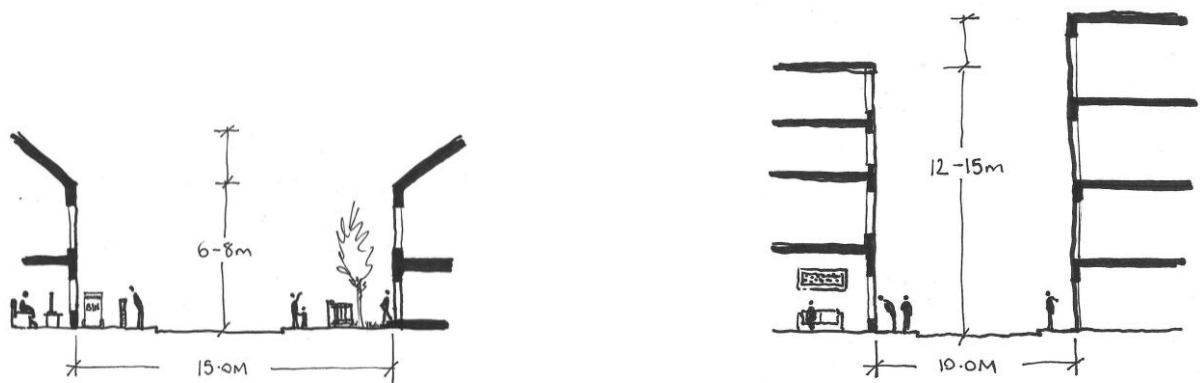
Indicative terraced street sketches. Left: Typical Belfast street section. Right: Typical Amsterdam street section.¹³
